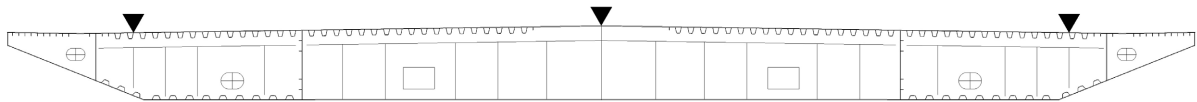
Schematic diagram of the layout of the linear change monitoring point after the installation of the steel box girder (cross section)
